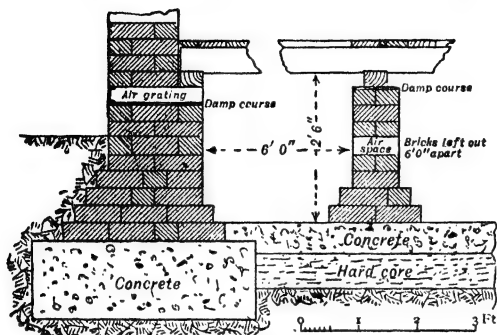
Part Section of Single Floor at Ground Floor level, with Supports.
